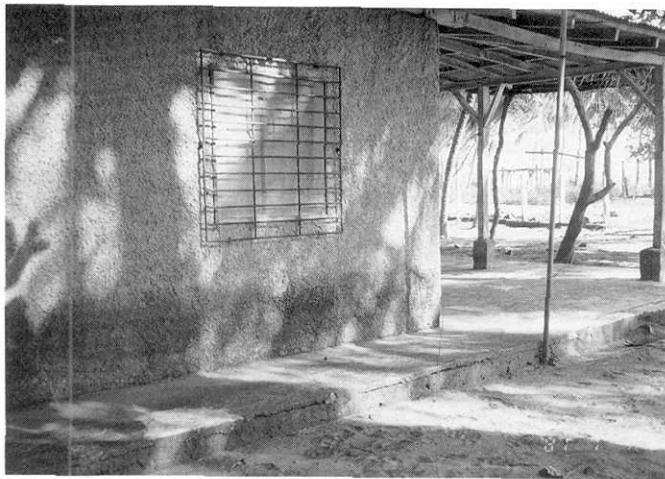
Trace of tsunami on a wall at Jiquilillo.
